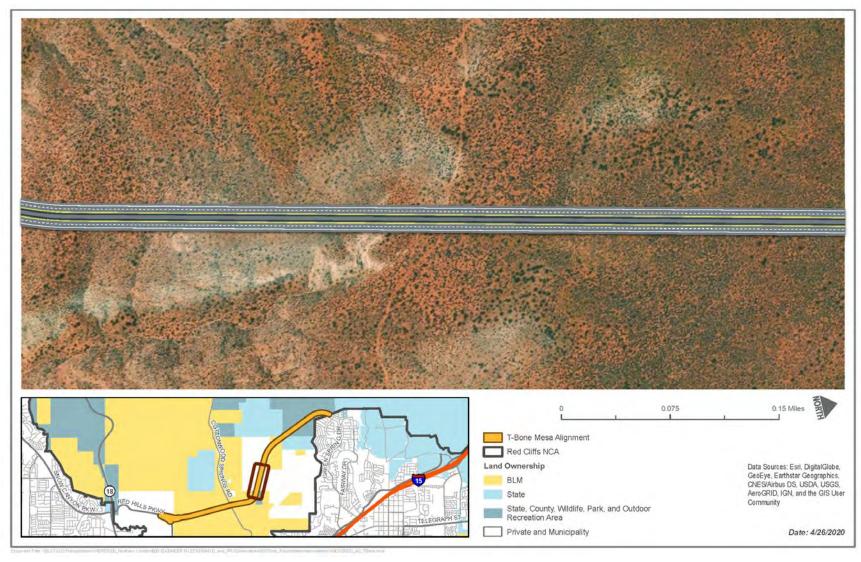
T-Bone Mesa Alignment Plan View (5 of 8)
